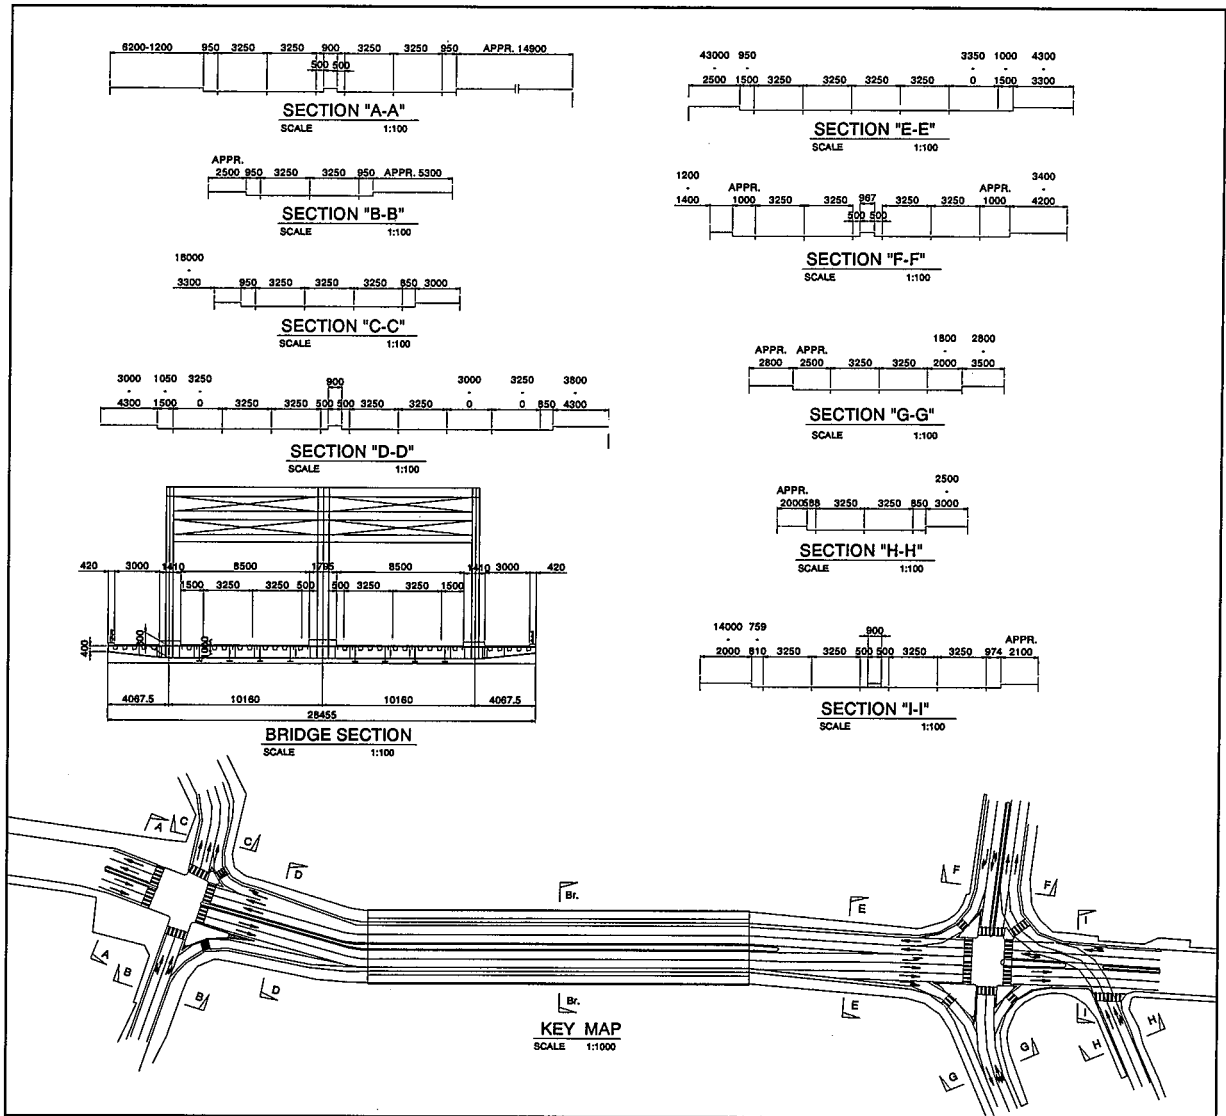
Road Cross Sections after Improvement Works
